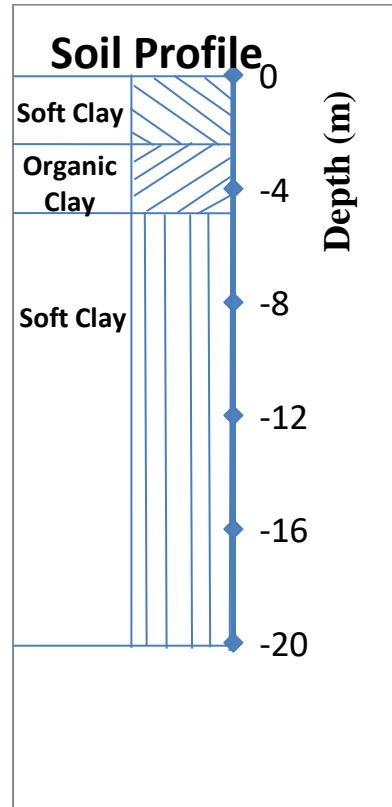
Soil Profile at Khulna Medical College Site (Ferdous, 2007)
